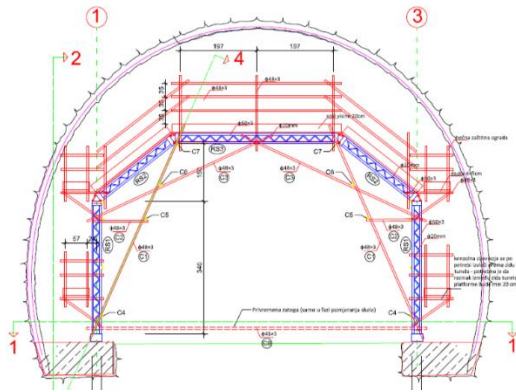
View of steel tunnel scaffolding, Vjeternik Tunnel, Montenegro [2]
